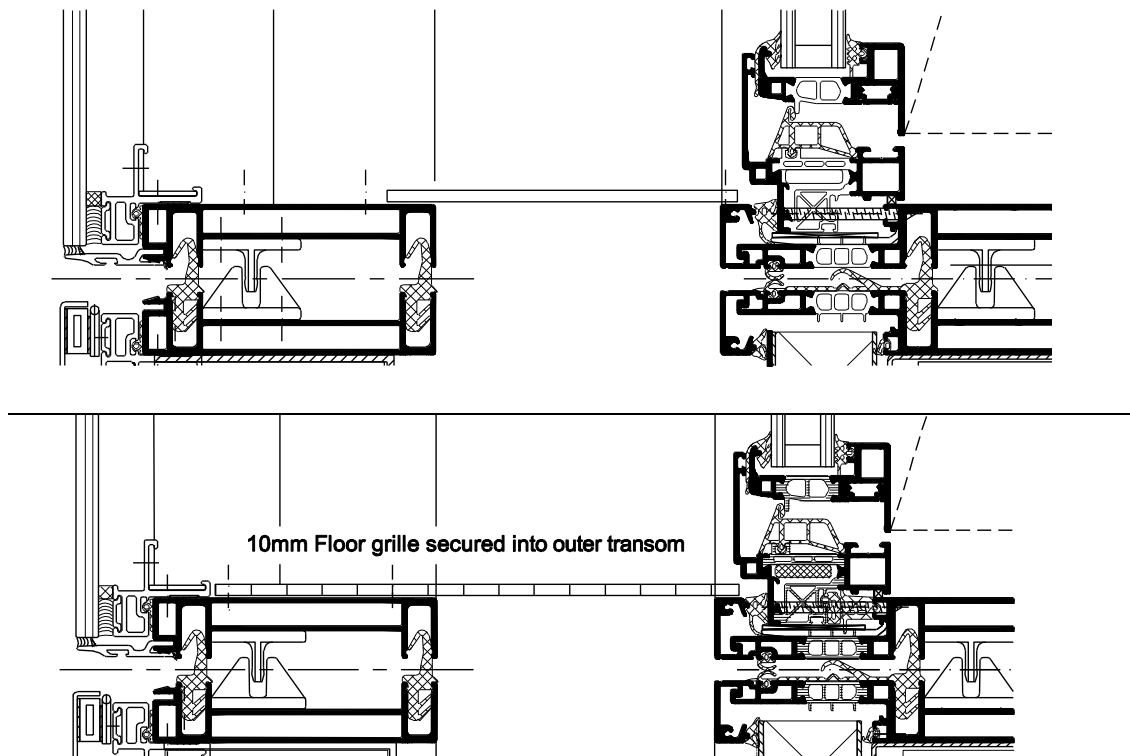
Cavity detail showing previous and new floor grille for improved access
